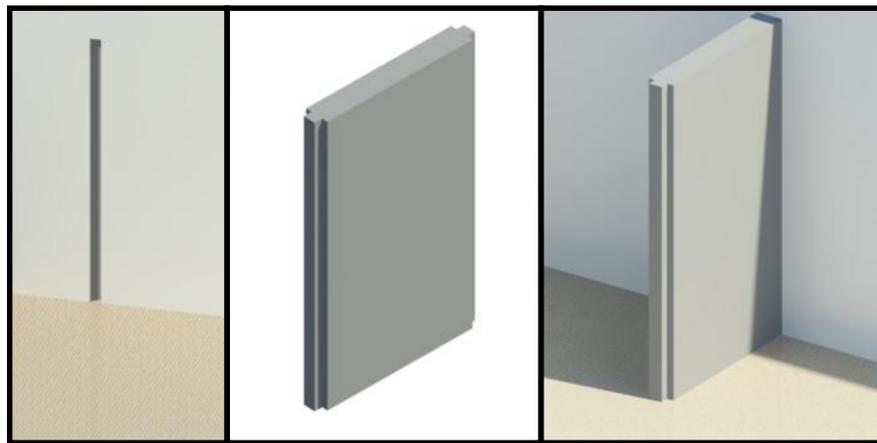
Exterior wall (a) IBS partition wall (b) and Installing IBS partition wall to the exterior wall (c)
